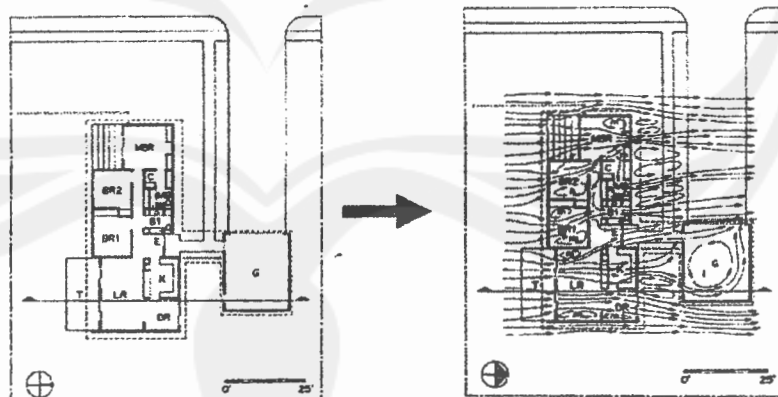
A floor plan based on such climatic concerns as orientation, shading, air movement, and solar gain (Adapted from Ref. 11)
